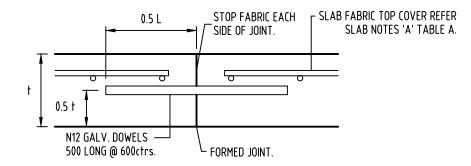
' TYPICAL TRANSVERSE CONSTRUCTION JOINT
